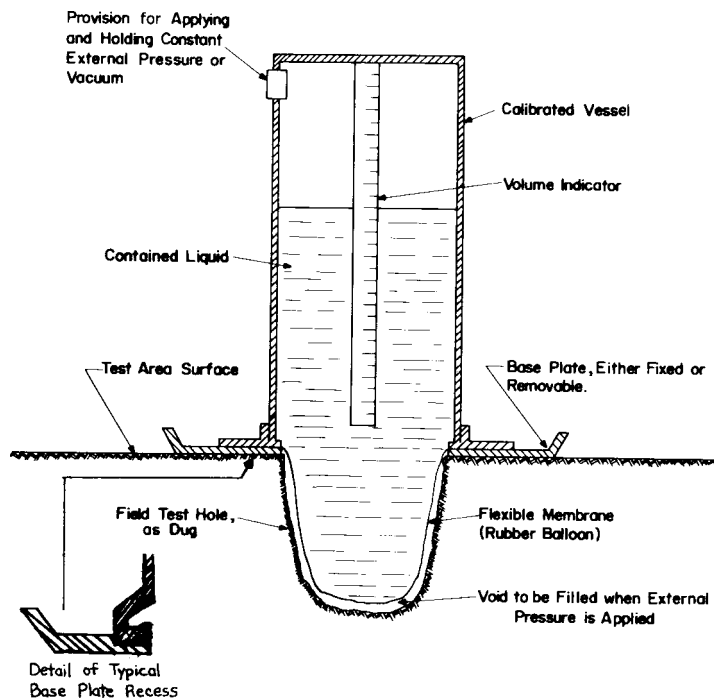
Schematic Drawing of Calibrated Vessel Indicating Principle (Not to Scale)
